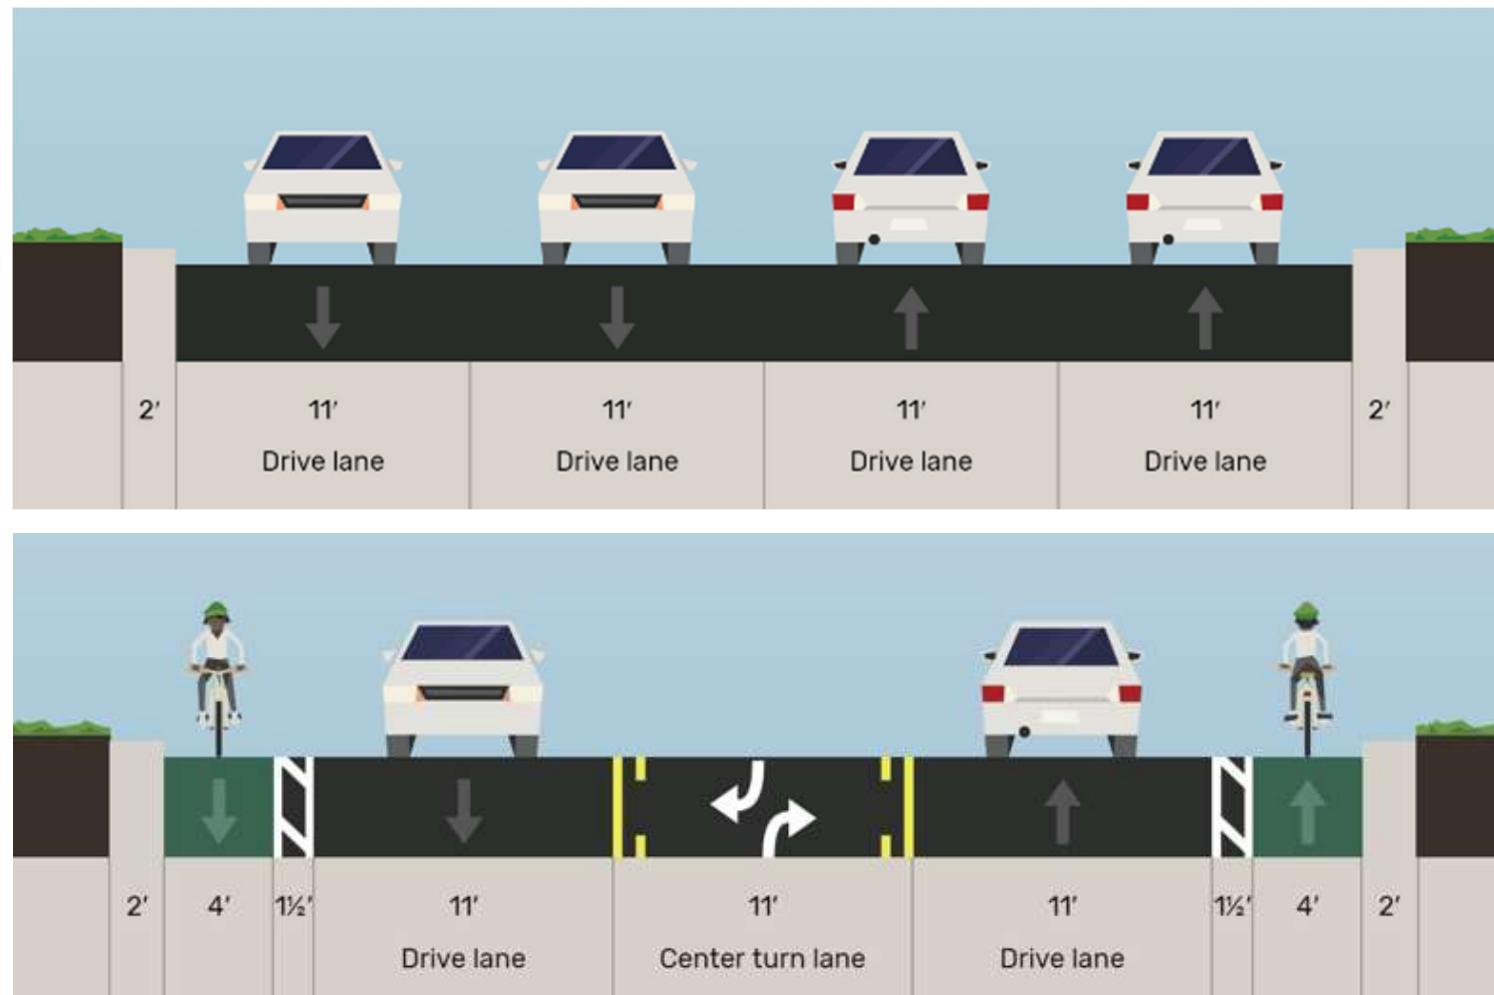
Mt. Clinton Pike – Existing (Top) and Proposed Road Reconfiguration (Bottom)
